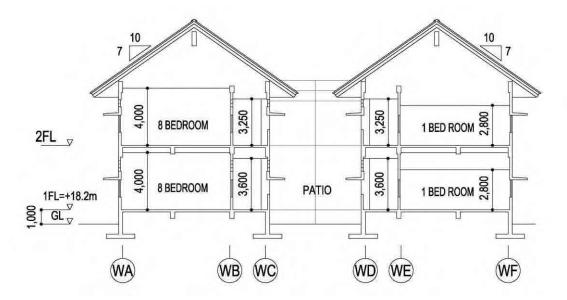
Cross Section of Obstetrics / Gynecology & Surgery Ward
